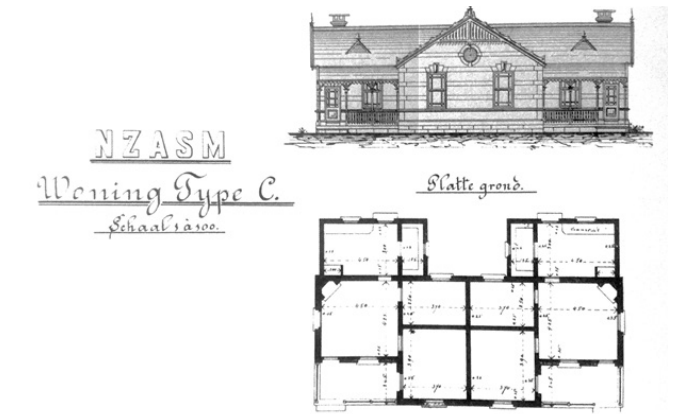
Plan and elevation of Type C semi-detached cottage, NZASM (De Jong 1988)
